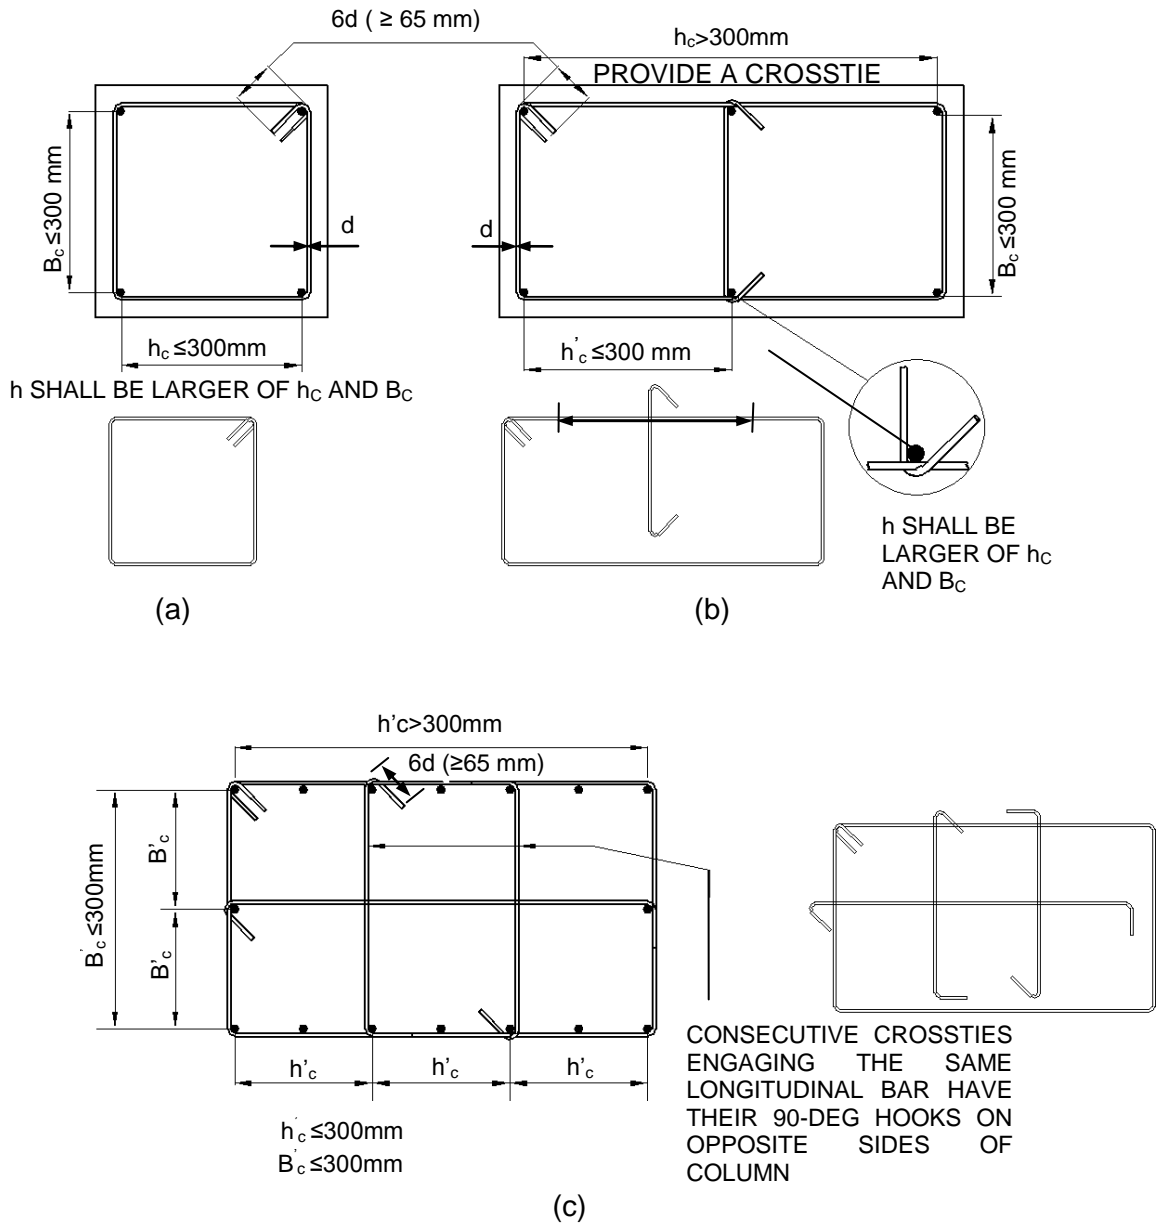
DETAILS OF TRANSVERSE REINFORCEMENT IN COLUMNS.
